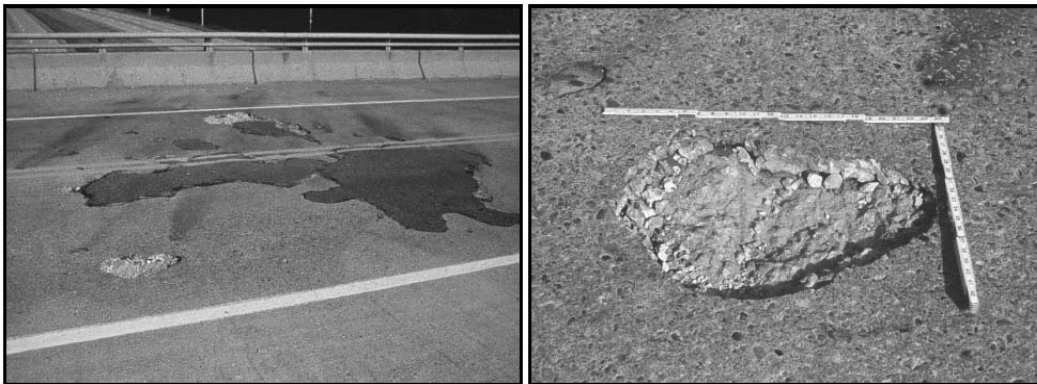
Spalls and distressed patches in Span 2 deck
